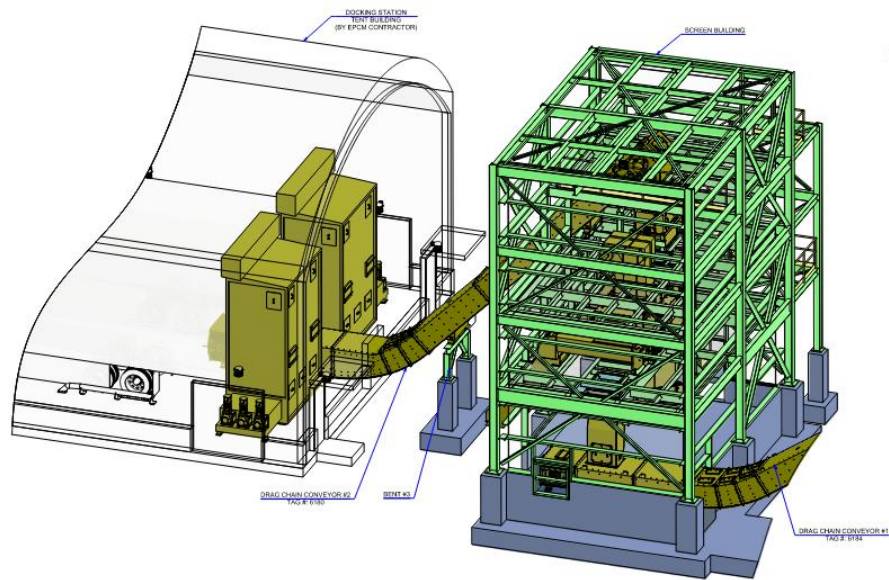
Isometric View of the Screen Tower (connecting to new Docking Station Tent Building)
